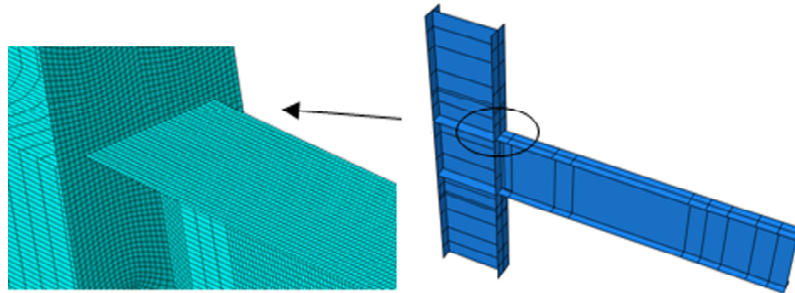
Cantilever model of WUF-W connection, specimen No. 3.
